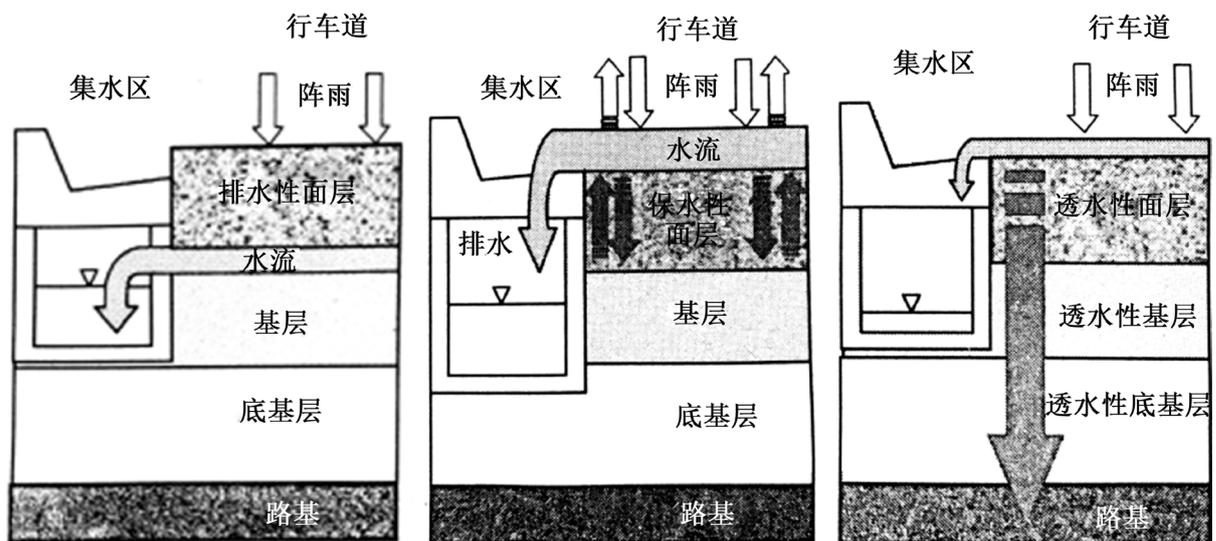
Structural diagram of drainage, water retaining and permeable pavement in Japan
